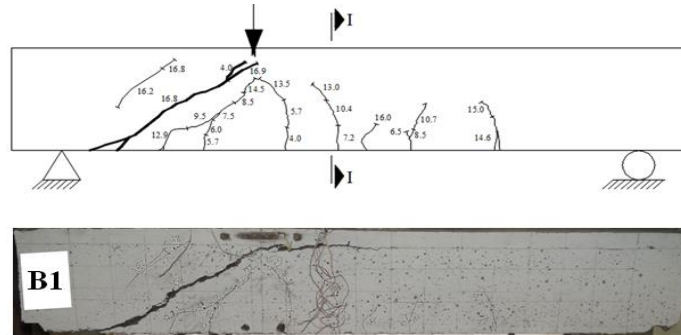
c. Cracking pattern and mode of failure for beam (B1) after repairing.
